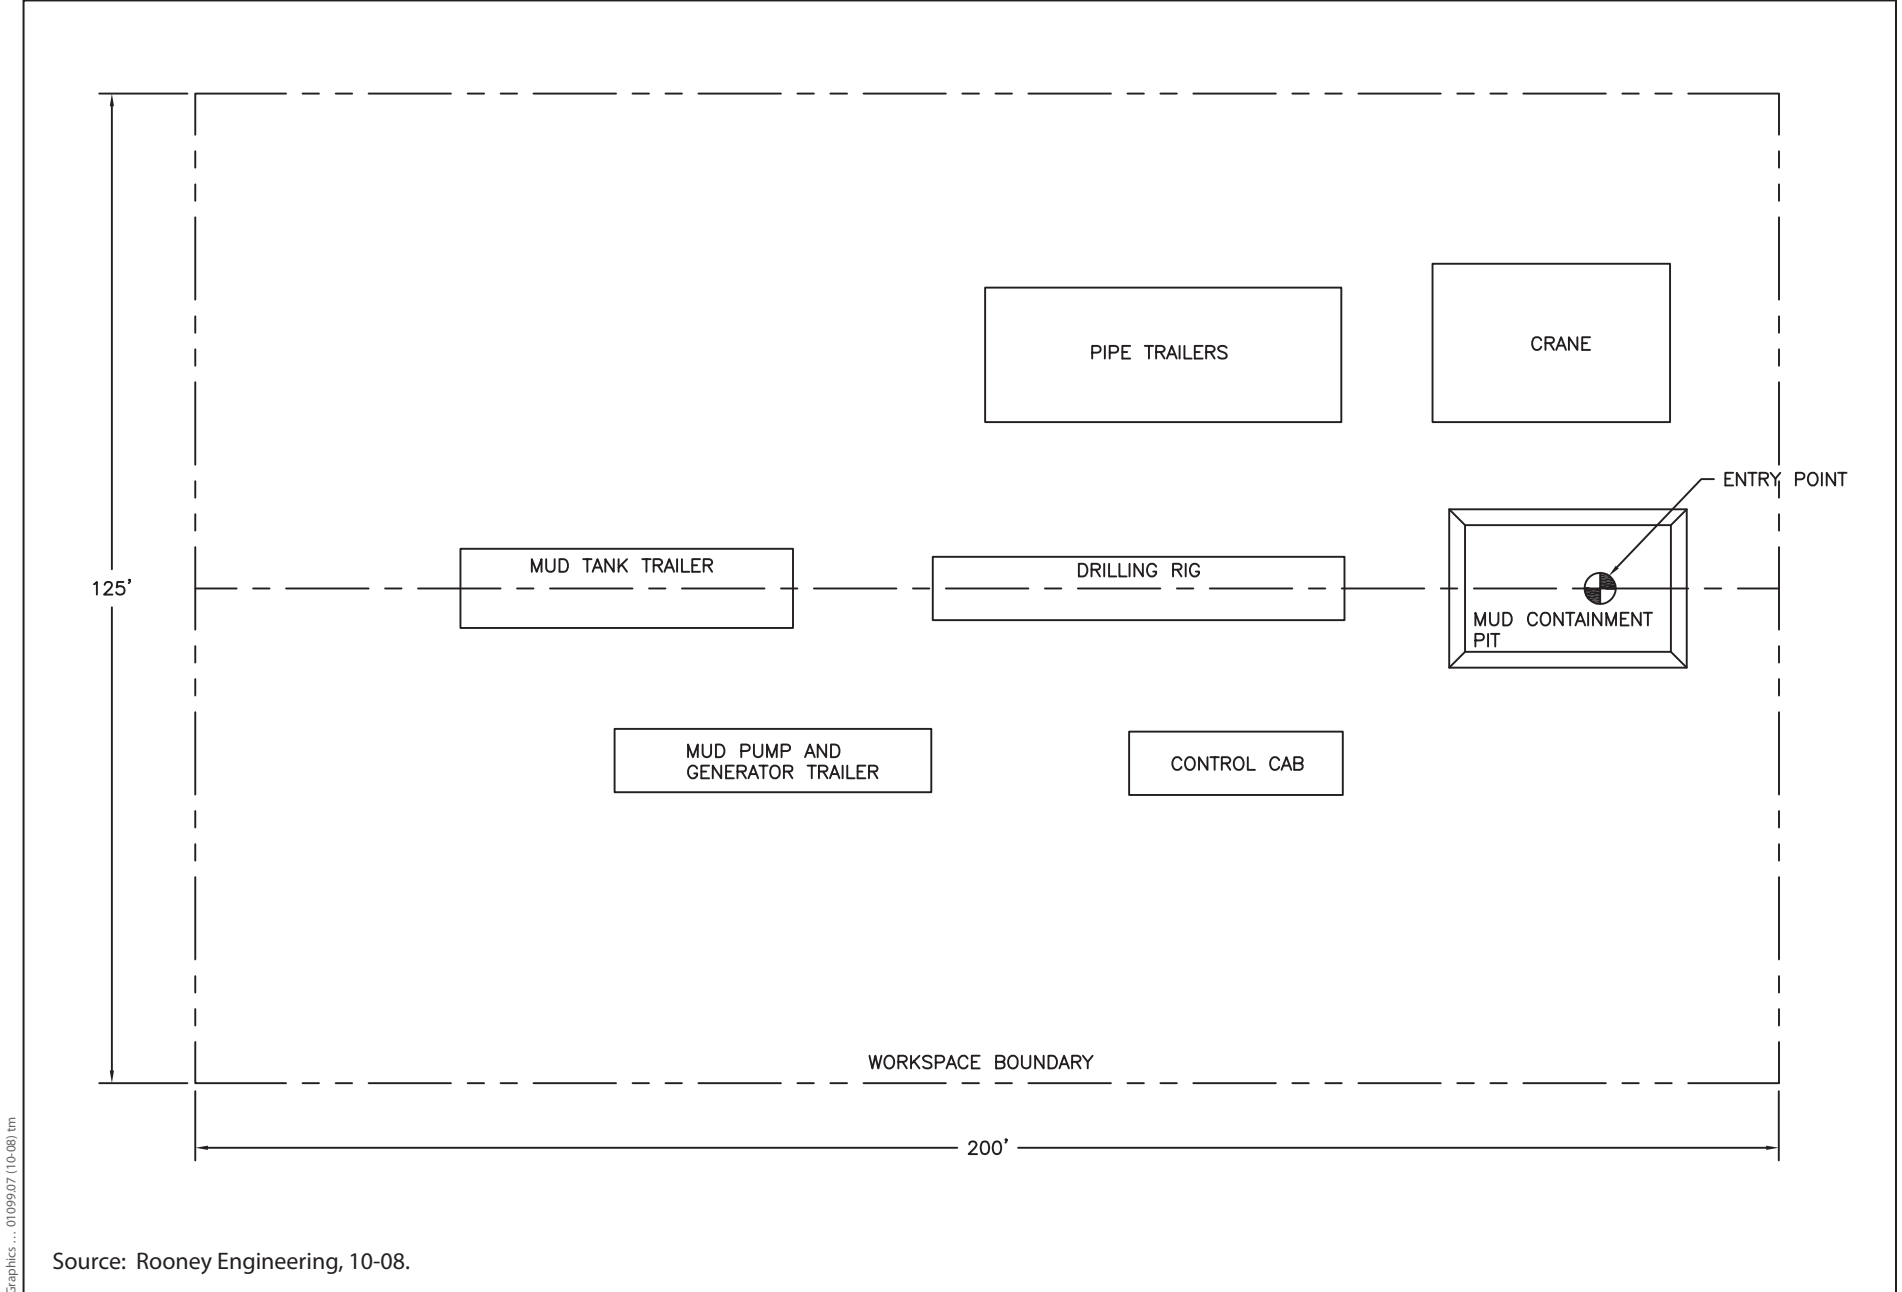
and 2-13 illustrate the workspace that is anticipated for typical horizontal directional drill entry and exit sites. The horizontal directional drilling method would be used for longer (more than 300 feet) and deeper (more than 20 feet below grade) crossings. This method requires a pilot hole that may be wet-bored by hydraulic cutting action using a jet nozzle, then reamed to the appropriate diameter with a reaming bit. These types of guided bores typically use bentonite, a fine, nontoxic clay that, when mixed with water, provides the necessary lubricant and operating fluid for the drilling process. The mixture is injected into the drill under pressure and recirculated back to the surface, where it is filtered and reused.
